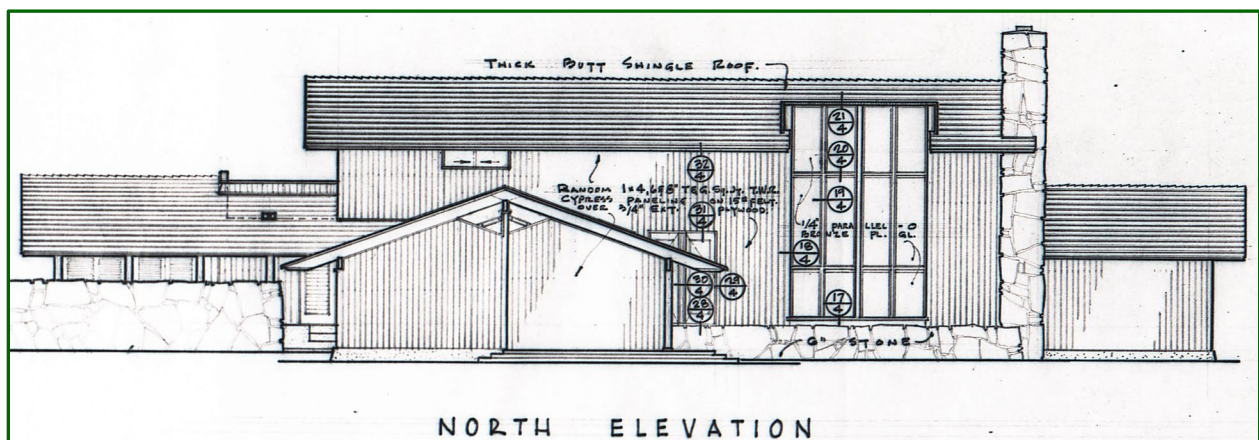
Parker Rear Elevation Drawing, Materials detailing, 1964
